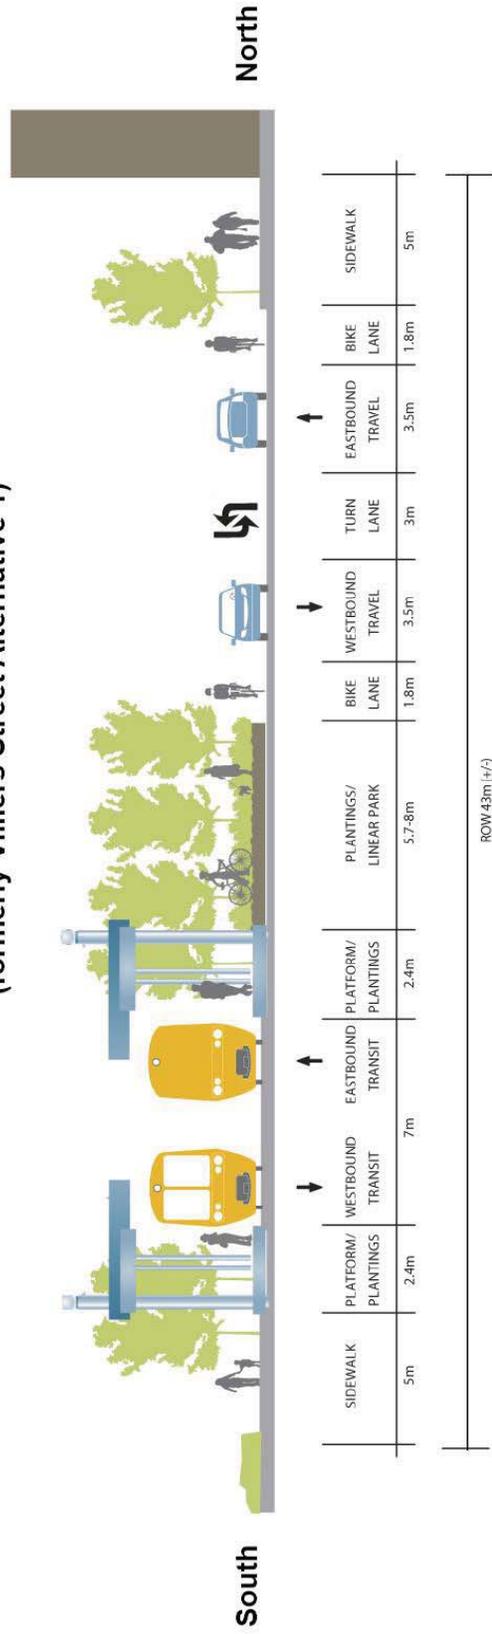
Cross-section for Commissioners Street (formerly Villiers Street Alternative 1)
